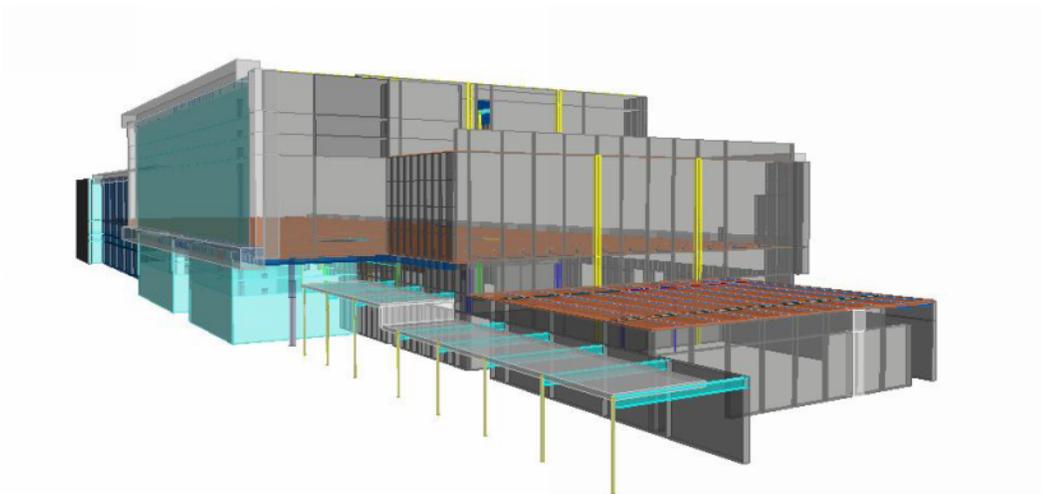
3D isometric view of the Main Building structural analysis model – West face
